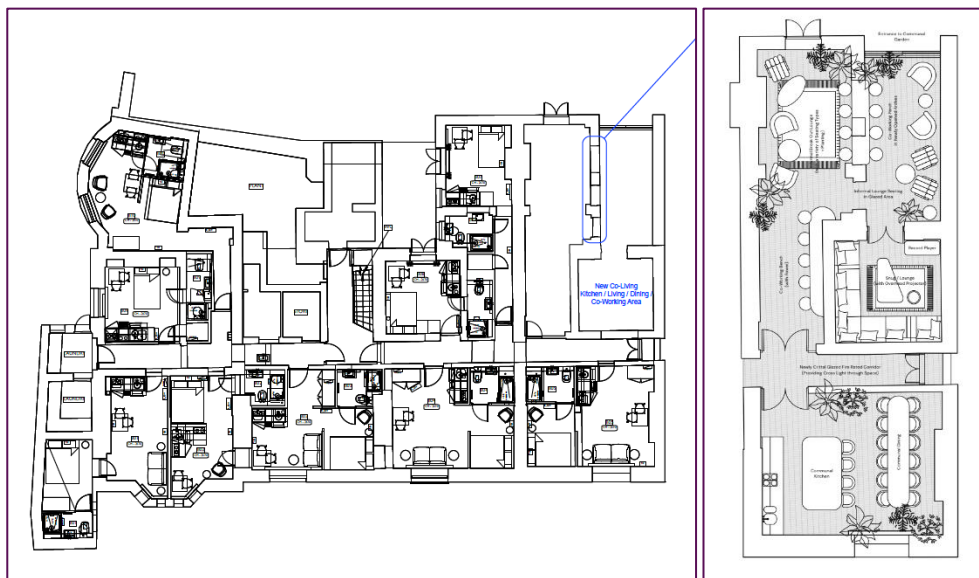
Location of the proposed public area (left) and new decorative layout (right)
